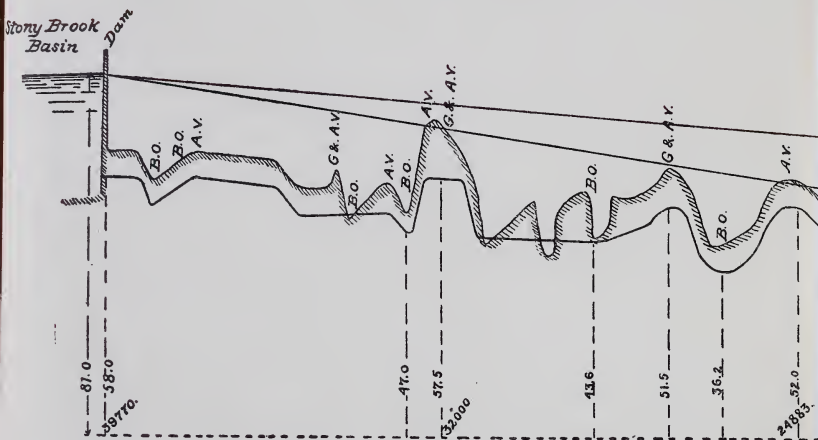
PROFILE OF CONDUIT, CAMBRIDGE WATER WORKS
